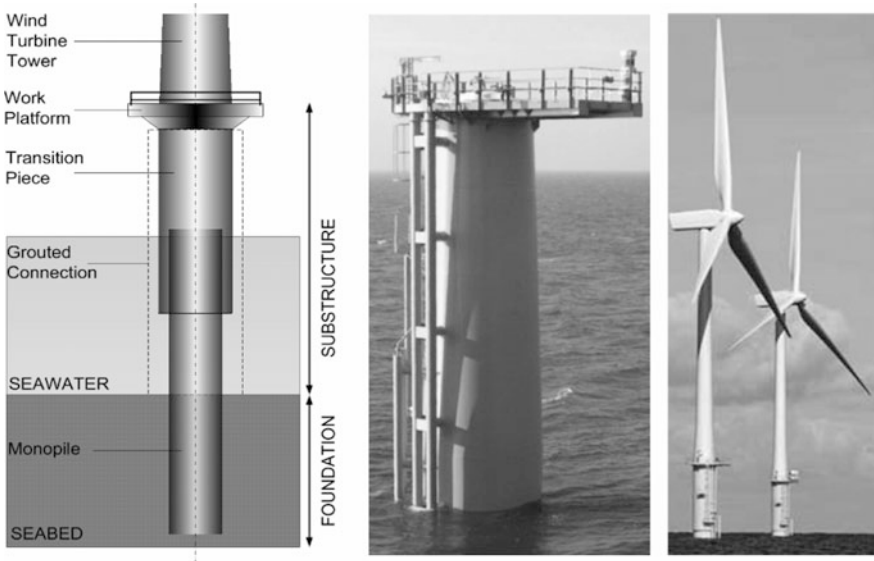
Illustration of grout connection for connecting offshore wind turbine towers with monopile foundations (courtesy of Institute of Mechanical Engineering, Aalborg University)
